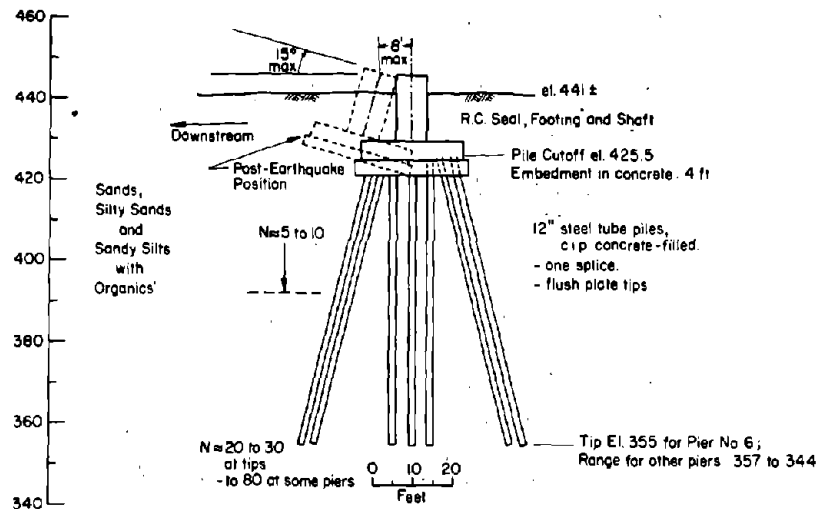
Bridge 605A (during construction): Snow River (lateral elevation of pier 6 as constructed at time of earthquake).
